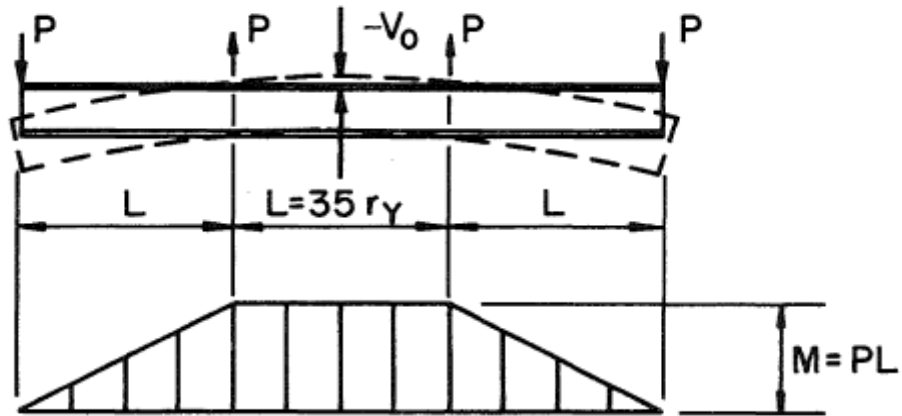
“HT-29” Girder Test Schematic (Lay et. al. 1964)
